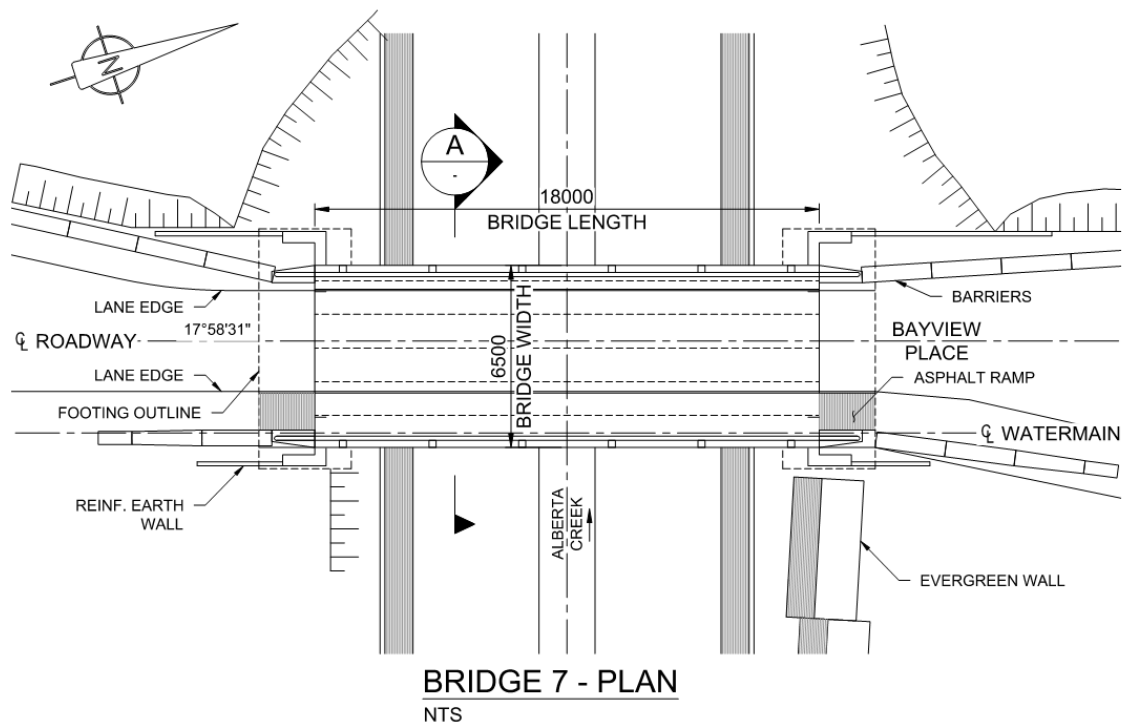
Bayview Place Bridge over Alberta Creek – Plan
